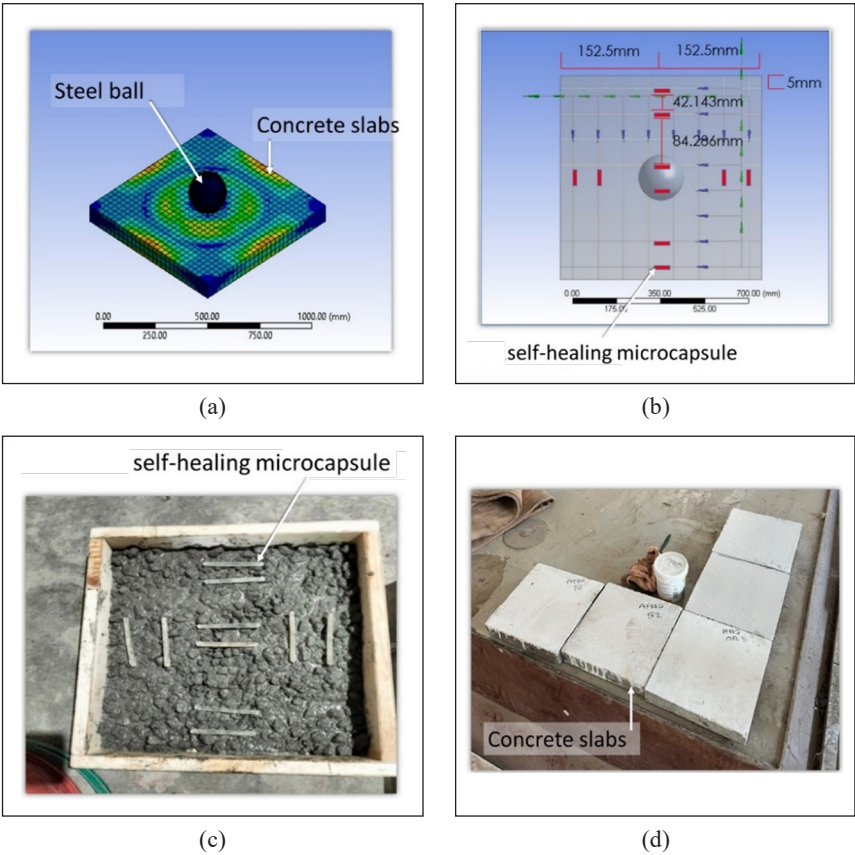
(a) The explicit dynamic analysis on the concrete slab model; (b) Schematic diagram of the microcapsule position; (c) Experimental arrangement layouts of self-healing microcapsules inside concrete slab specimens; and (d) Concrete slab specimens with white bottom surfaces
